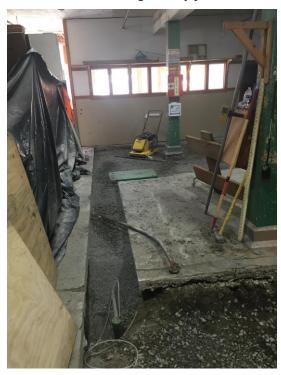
School interior showing interior hot water flushing system piping, facing east.
